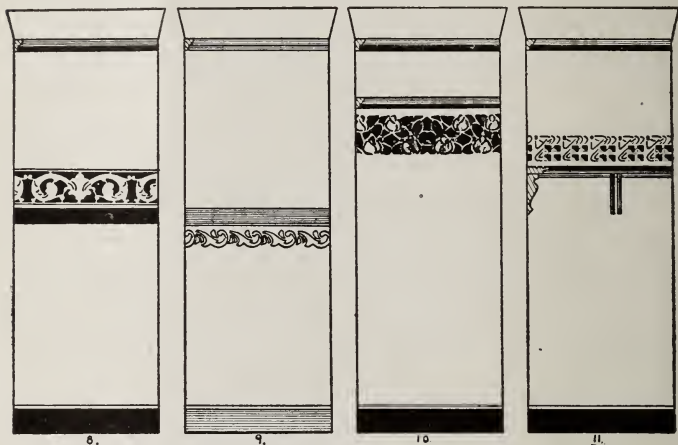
Stencils Appropriate for Rooms with High Ceilings.
